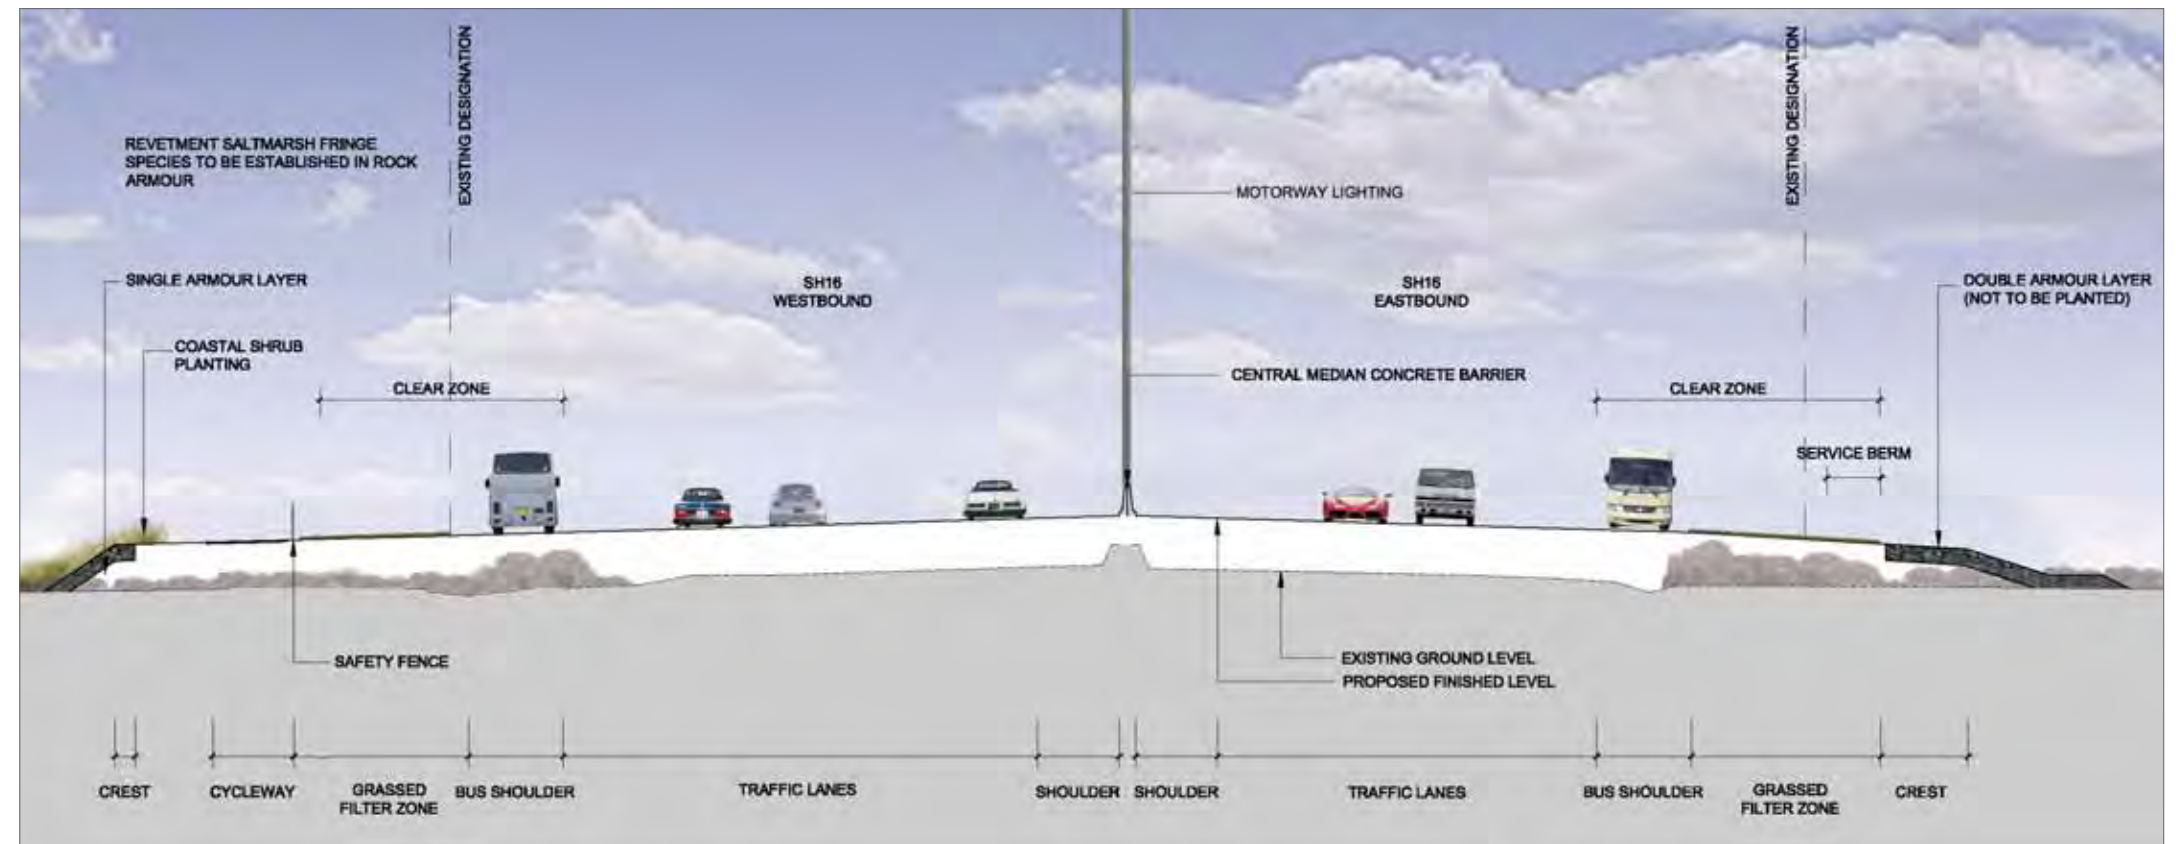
Future cross-section at Traherne Island compared to existing arrangement (Section D)
